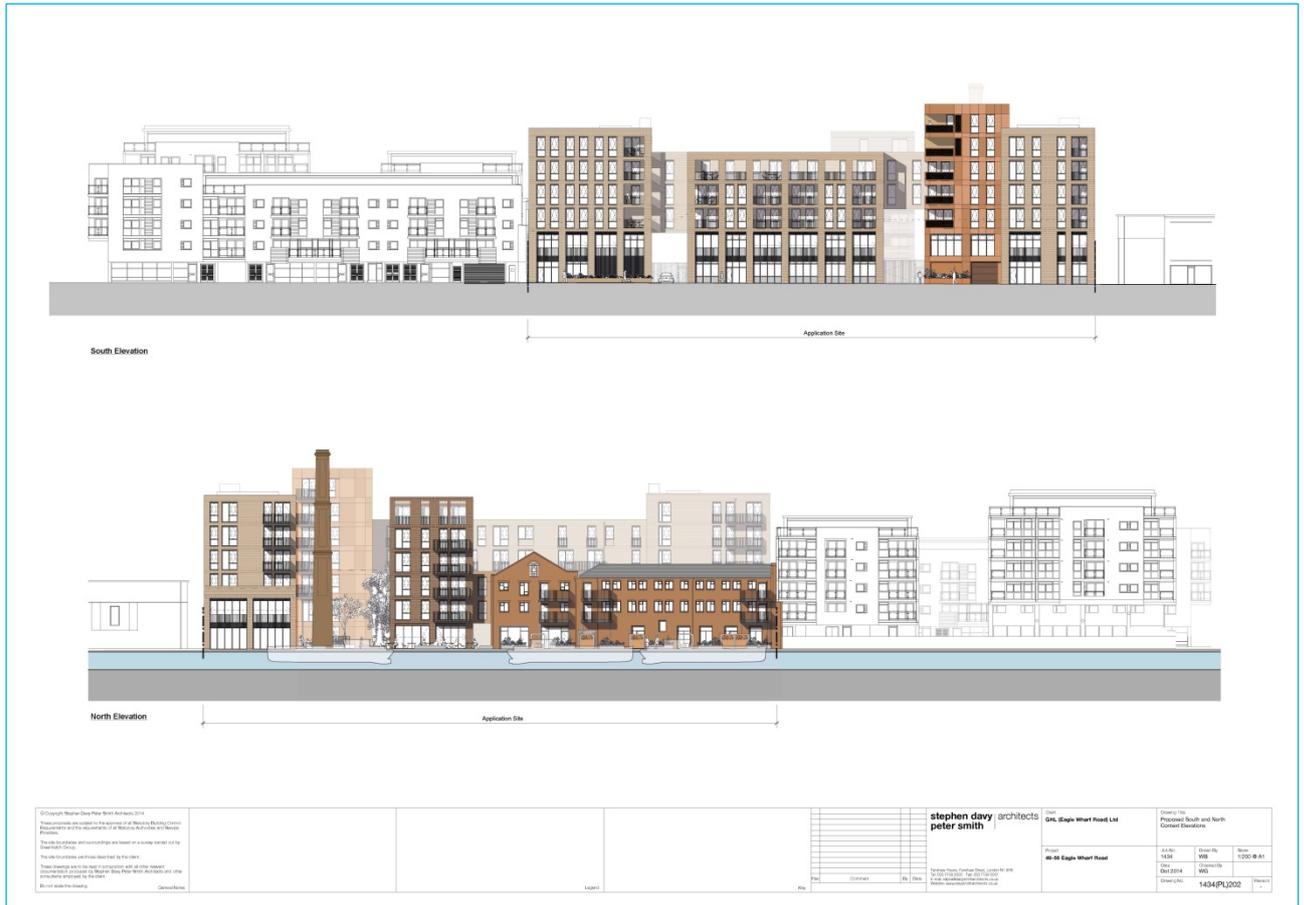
Proposed south and north context elevations (Drawing 1434(PL)202, dated October 2014). For a larger plan see the pdf document submitted with planning application.
